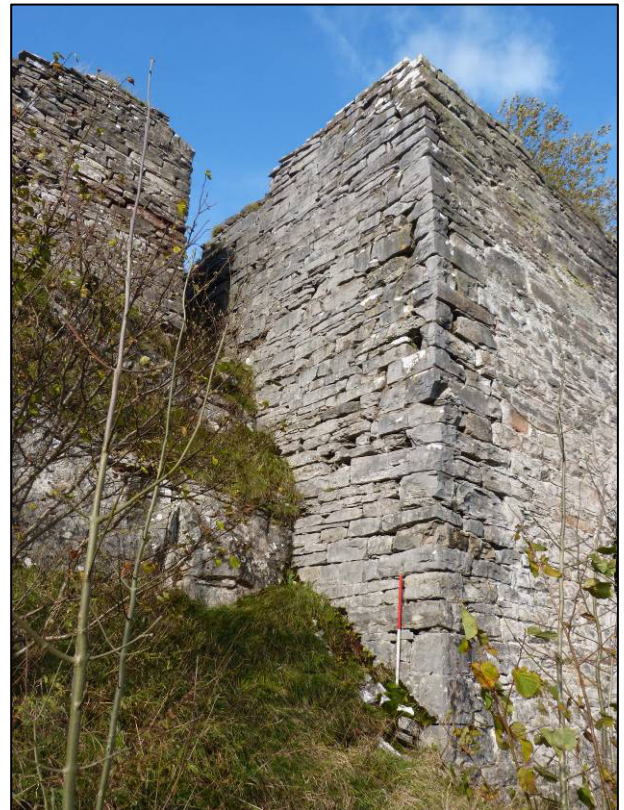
Smardale kilns, south elevation, looking NW (photo 1/010).
